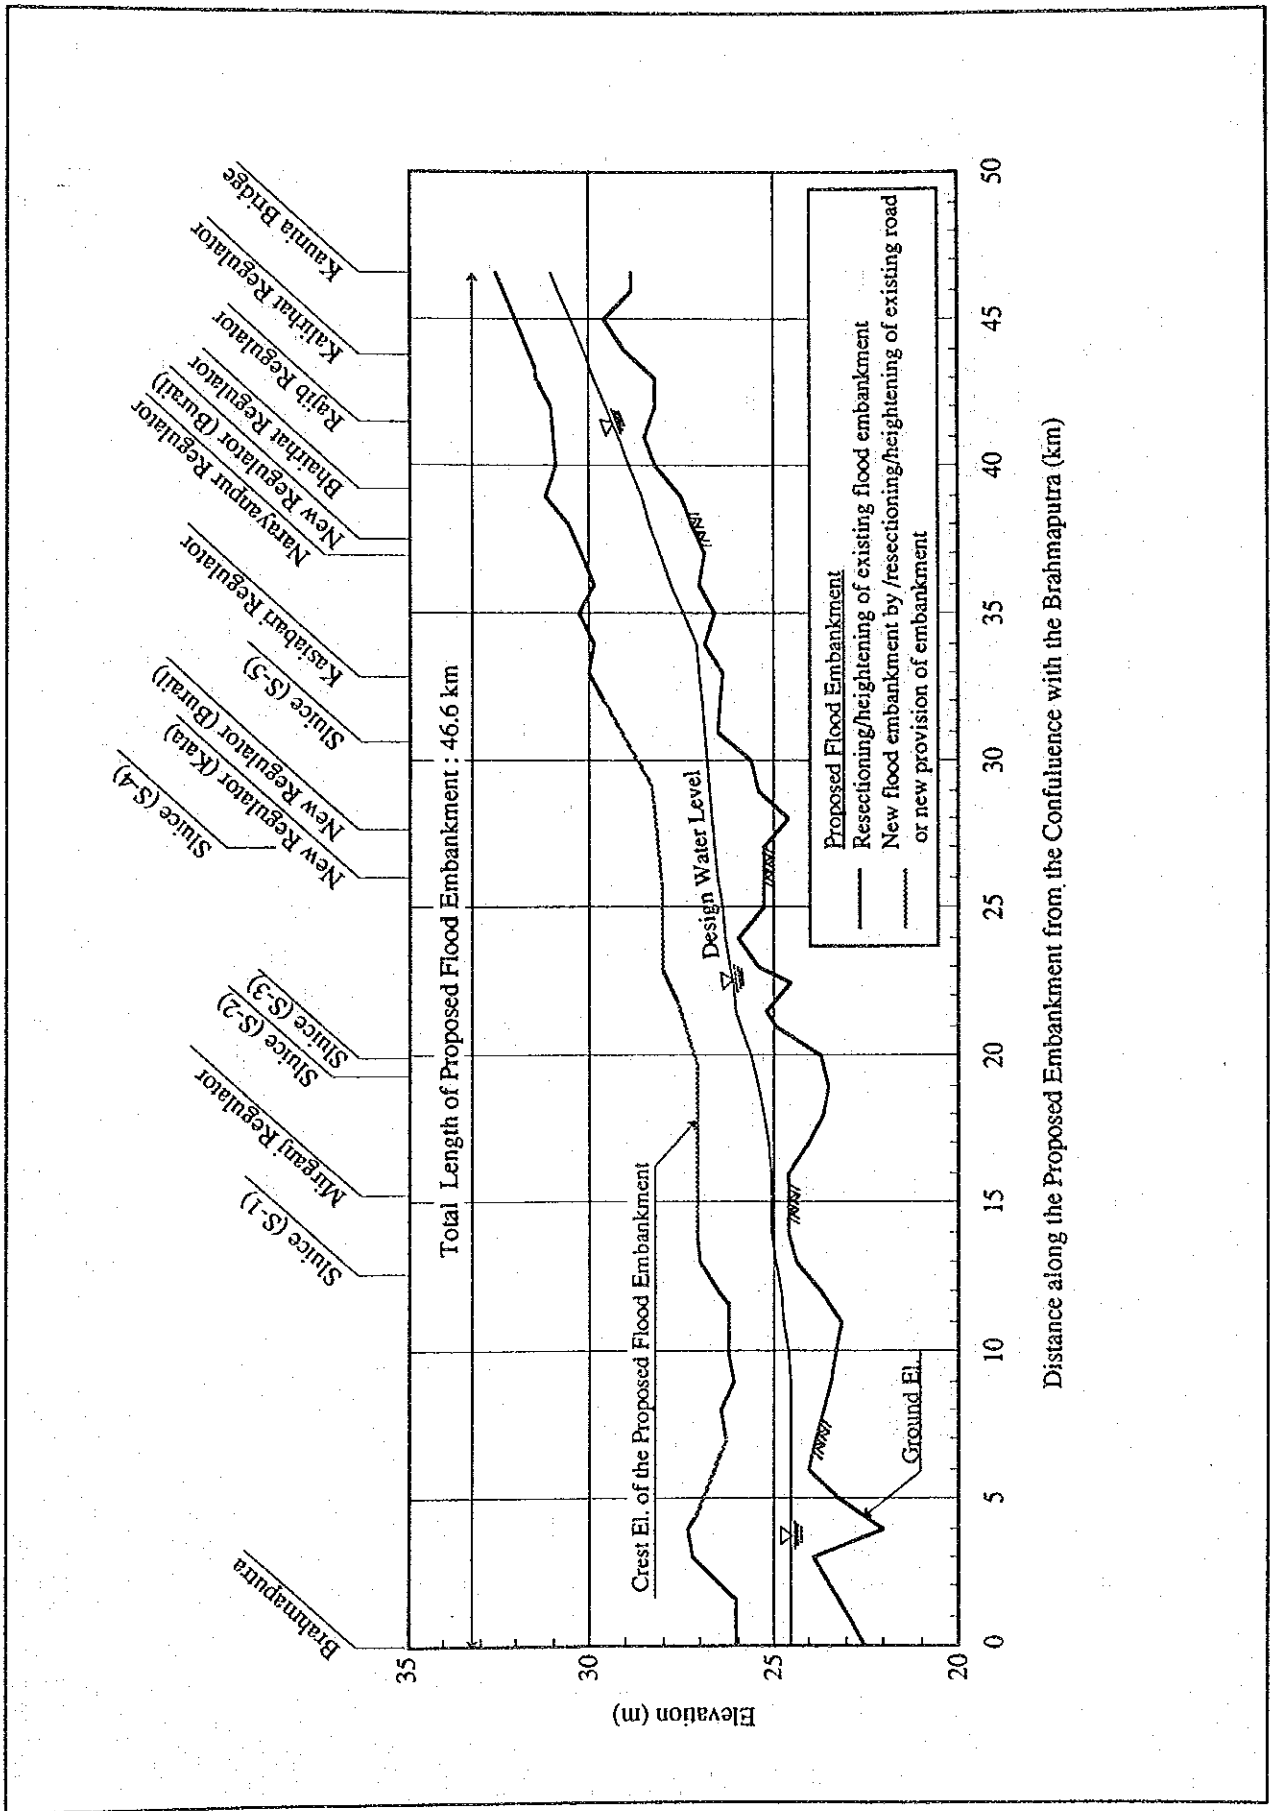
LONGITUDINAL PROFILE OF PROPOSED GHAGOT LEFT EMBANKMENT
